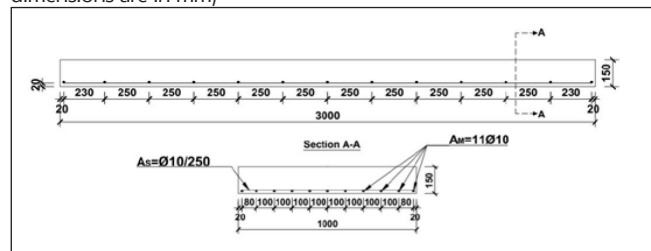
Reinforcement details and dimensions of the specimen (all dimensions are in mm)
